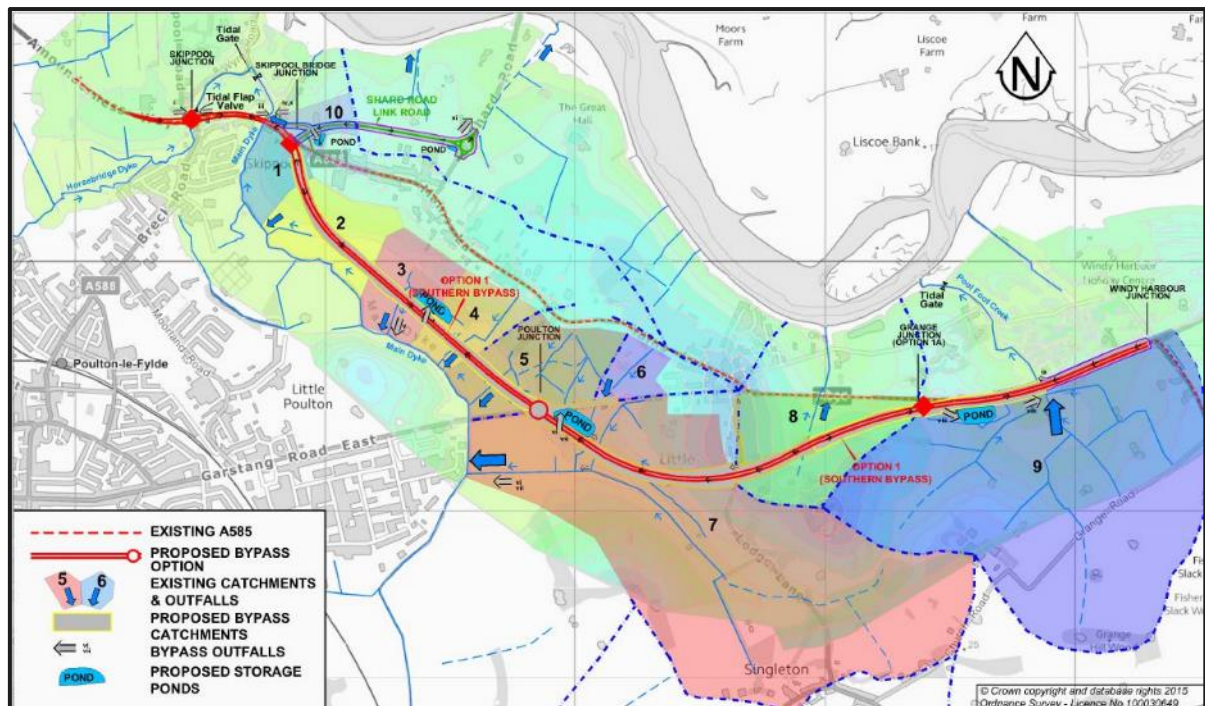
Existing catchments and proposed Option 1 highway drainage outfalls
